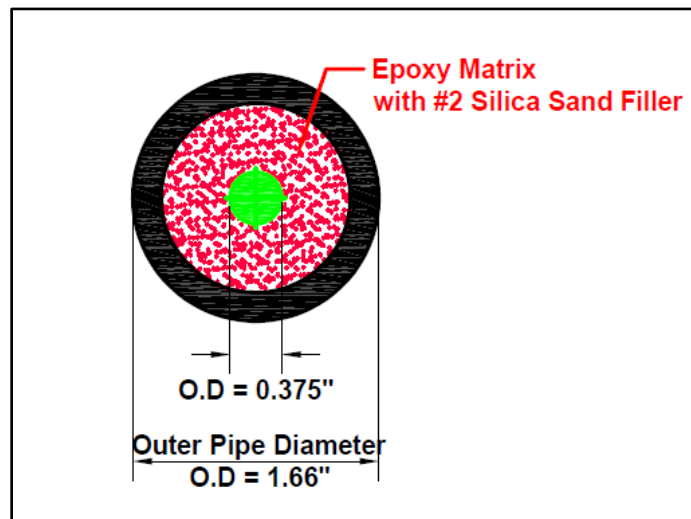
ASTM D7205 Tensile Test Specimen Cross-Section
